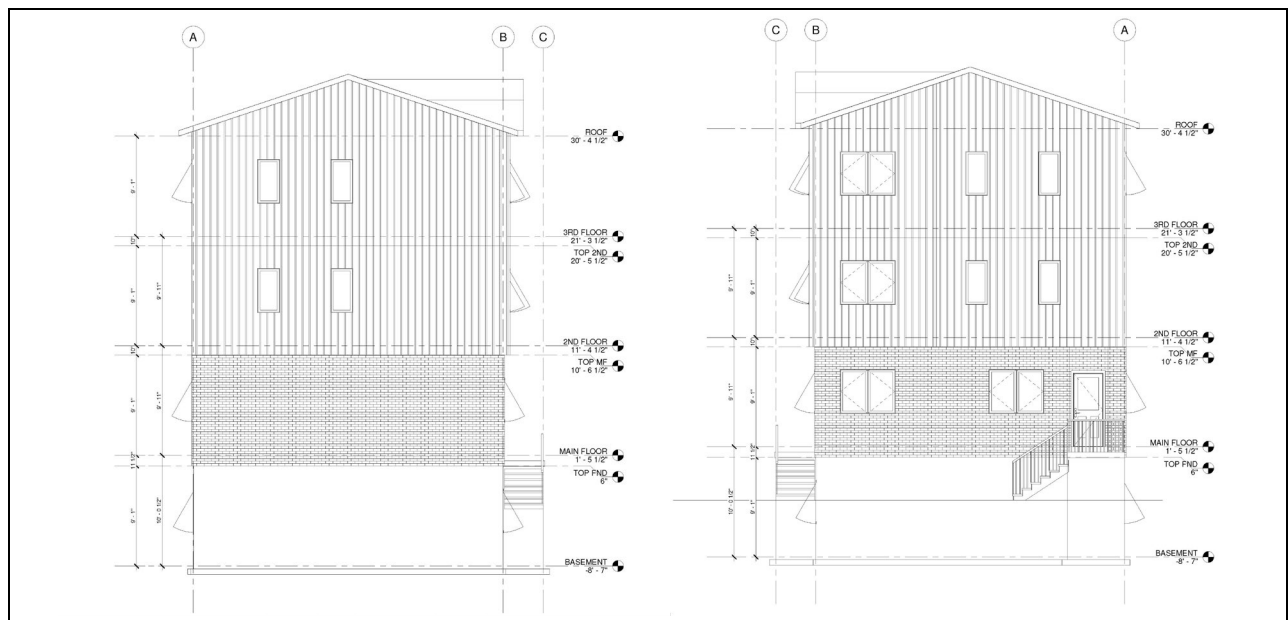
Proposed stacked townhouse elevations (looking north/south)
